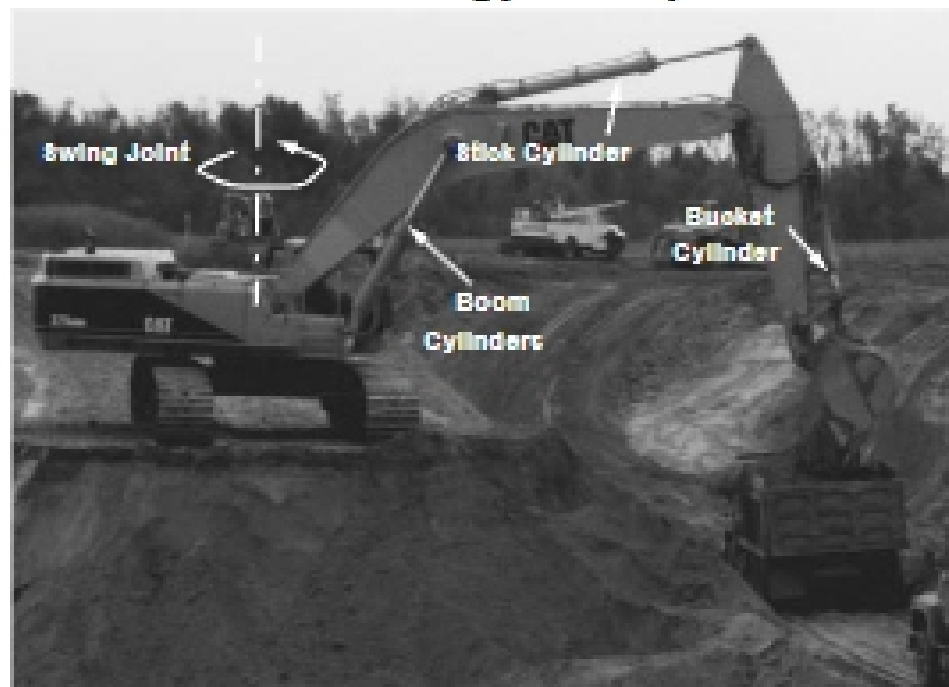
A typical excavating machine (Hydraulic Excavator)
